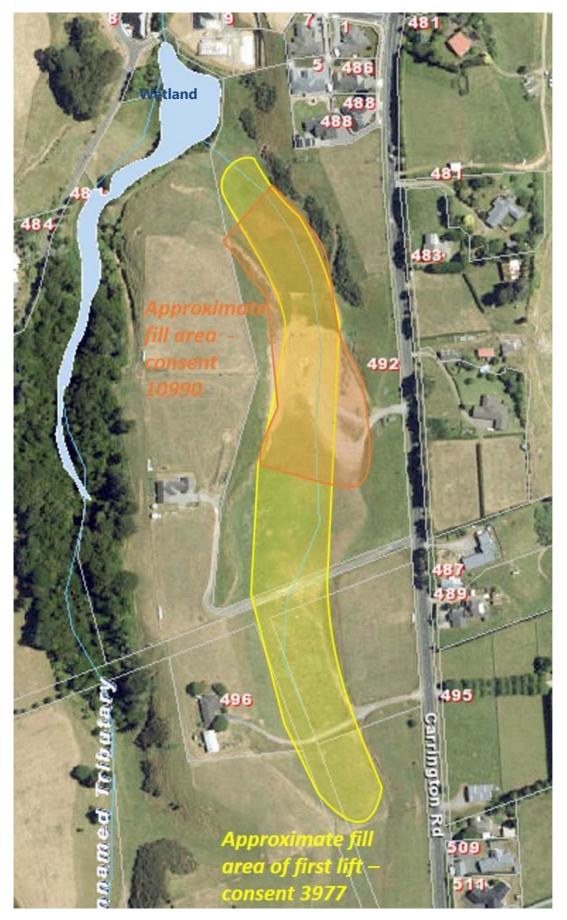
Taranaki Civil Construction cleanfill on Carrington Road, Hurworth
